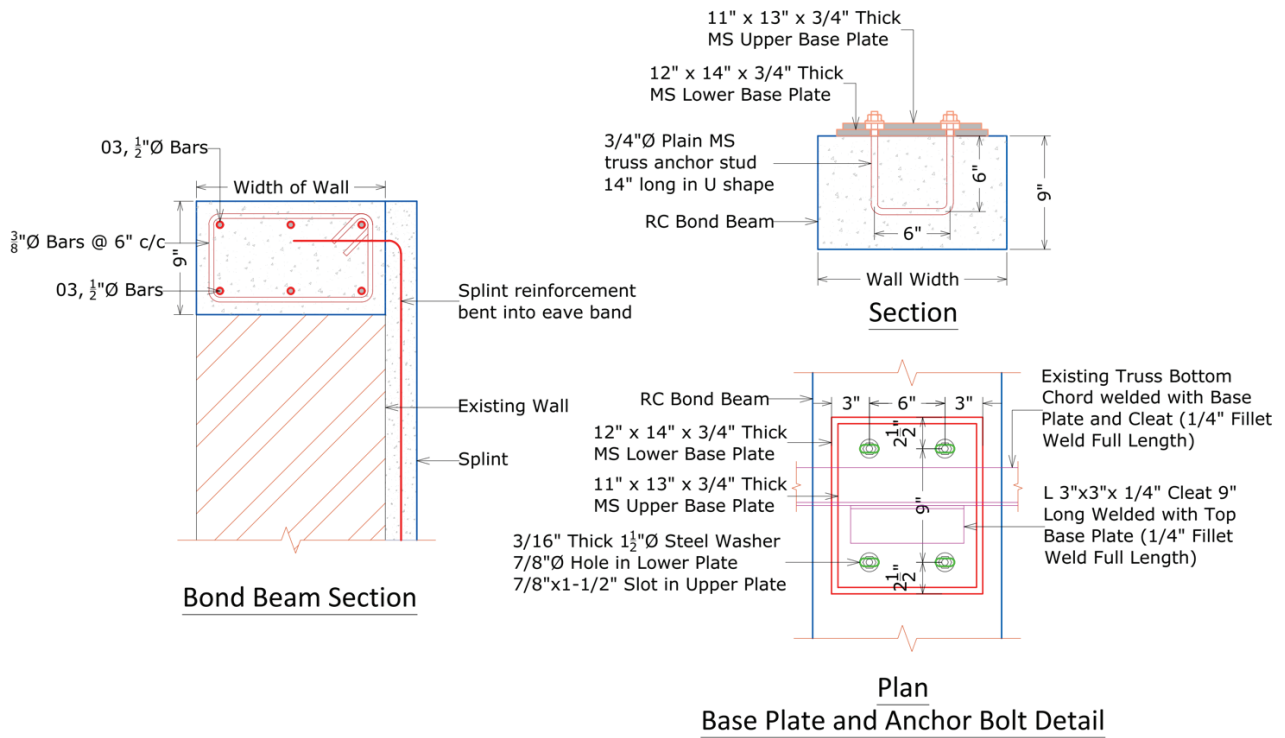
Detail of eave level bond beam and truss anchorage details for buildings with wooden or steel Trusses
